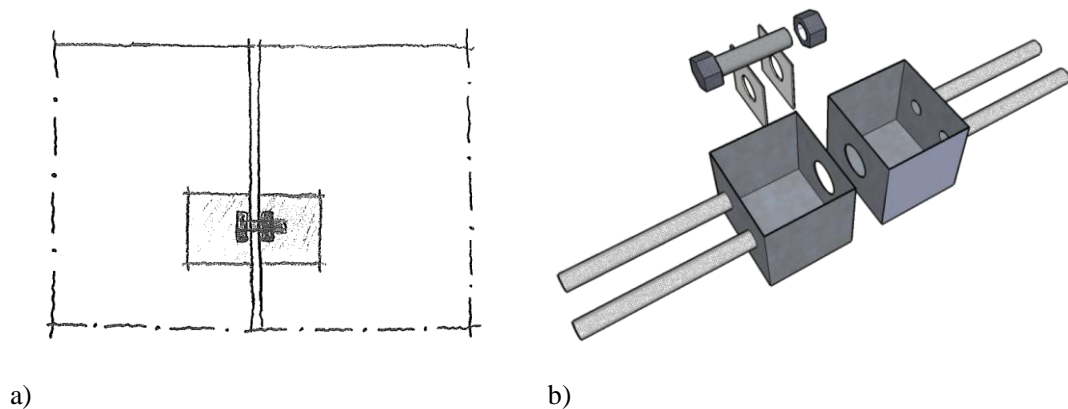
Connection device between floor elements and between wall elements vertical joint.
